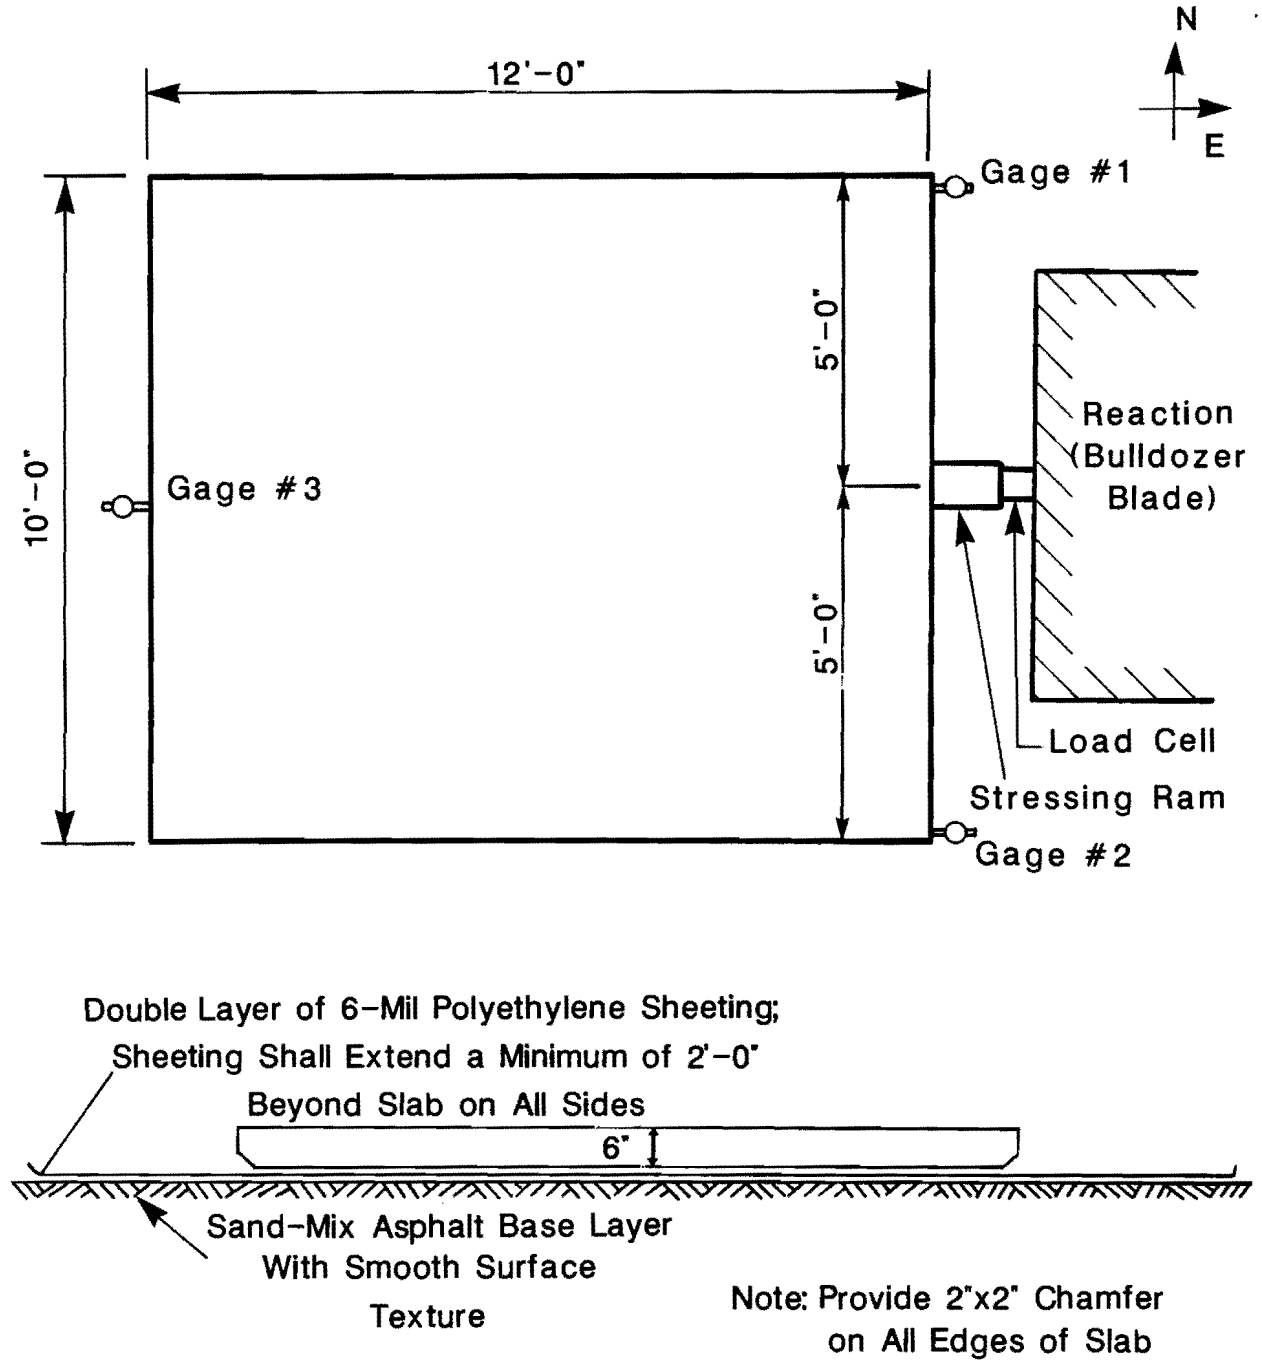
Layout for Test Slab No. 1 with double layer of polyethylene sheeting.
